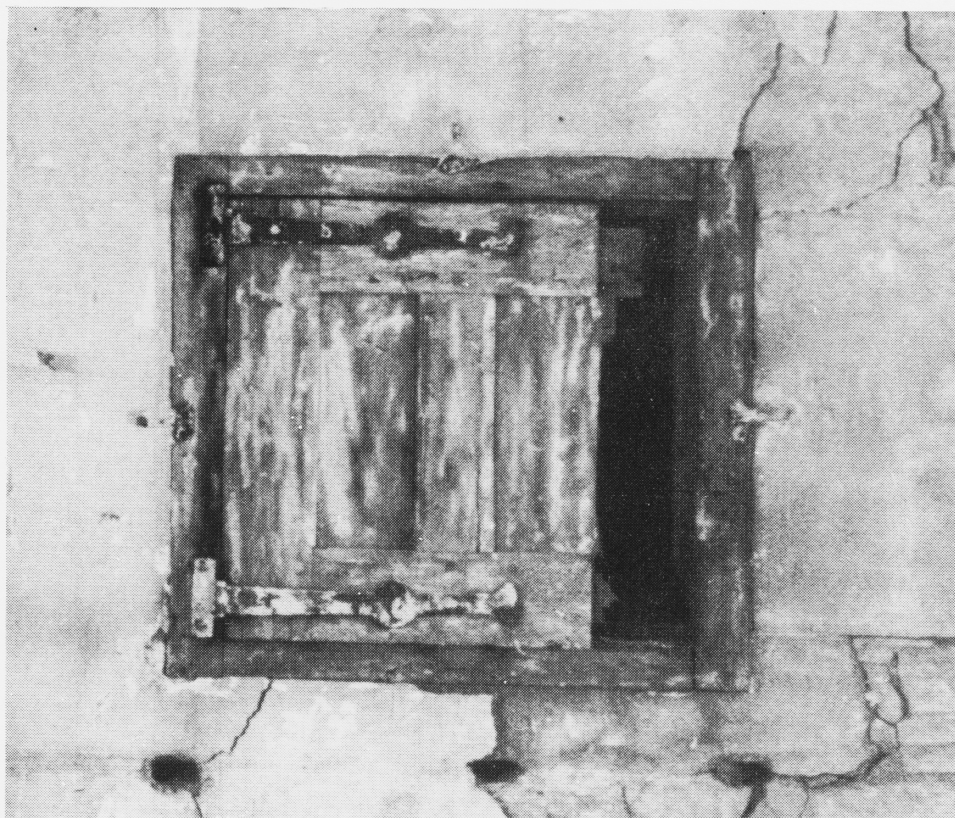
Hoddom Castle, second-floor S wall, detail of cupboard 1978.
